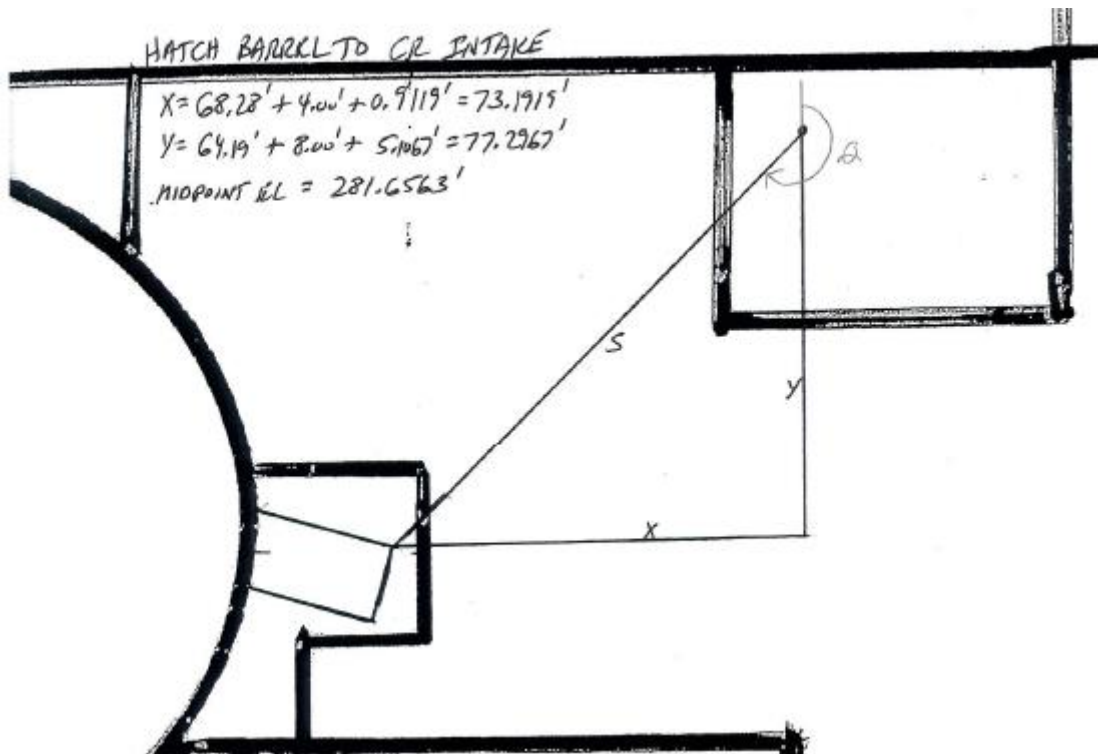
Equipment Hatch Barrel Access Door (Point Source) to Control Room Inlet
